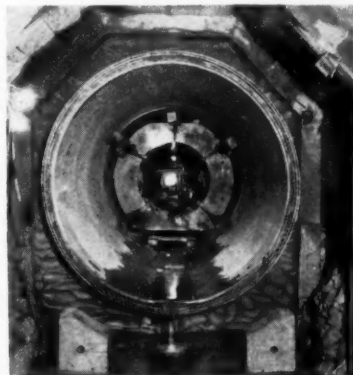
The centering jack is shown in this picture and the foundation concrete backfill was carefully placed, as shown
